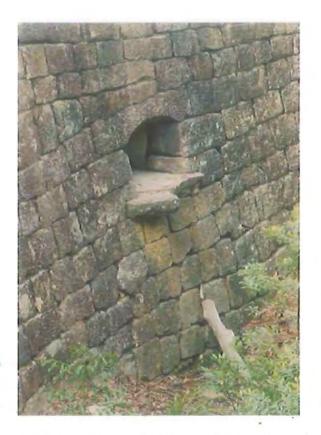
Stone culvert in retaining wall, Devine's Hill. (Photo: Ingereth Macfarlane)
